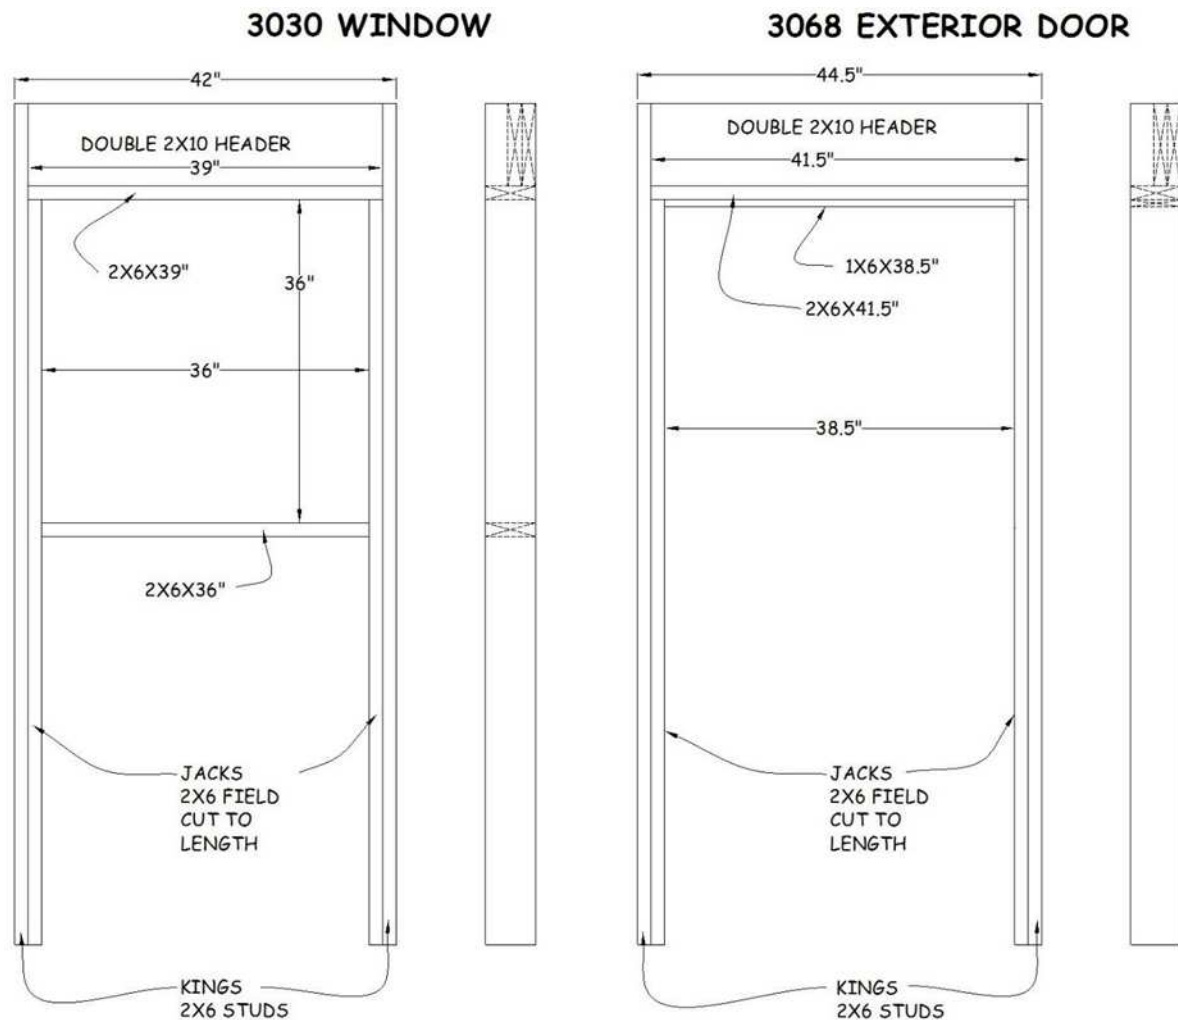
Examples of Exterior Wall Component Assembly Drawings.
